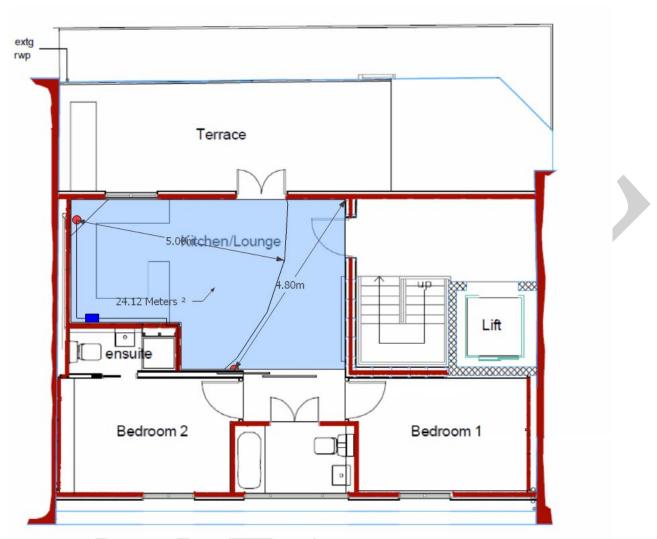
Apartment 5 Automist to be provided in the kitchen and lounge side of the 'nib' of the wall to bedroom 1.
